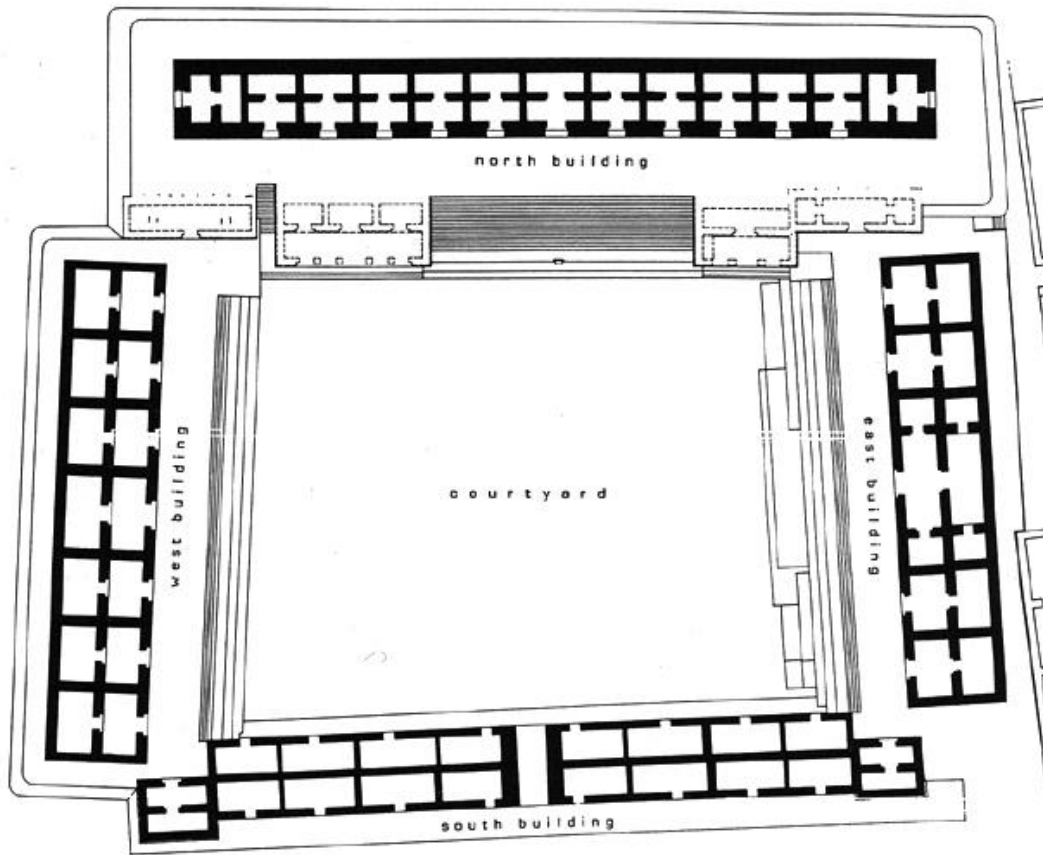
Plan view of the Nunnery quadrangle, Uxmal (Andrews 1995b)
